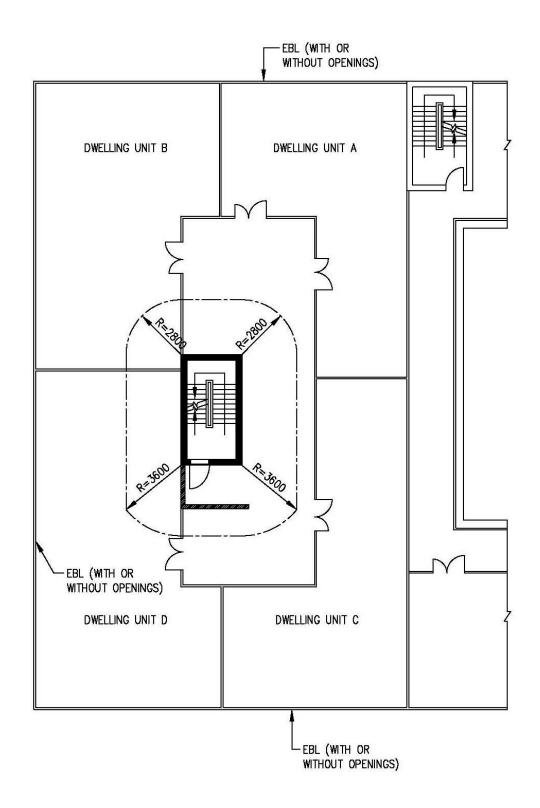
(b) REQUIREMENT ON SETBACK DISTANCE OF SS WALLS (WITHOUT DOWN-HANG BEAM)
